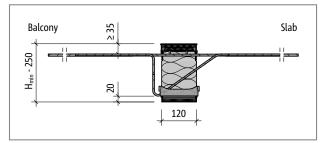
Schöck Isokorb® XT type K-M1 to M4: Product section
